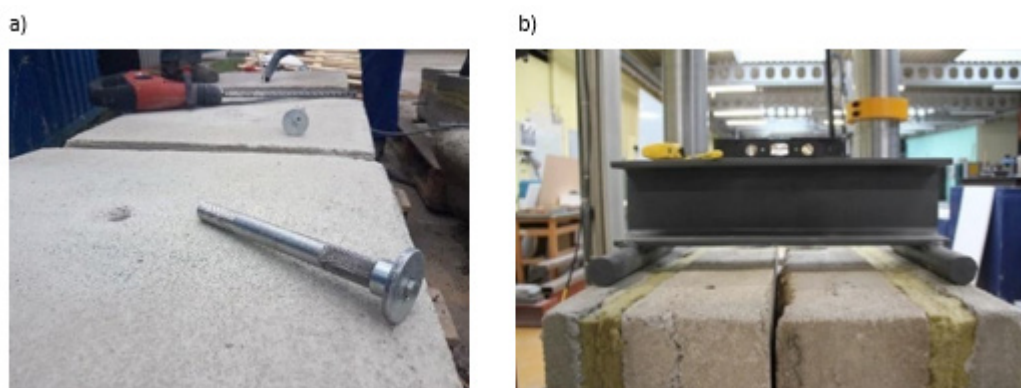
Concrete matrices: a) installation of bonded anchors, b) load transfer frame after leveling.
